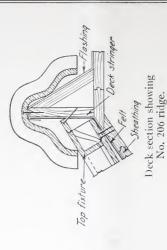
# DETAILS OF IMPERIAL SPANISH TILES AND FITTINGS
